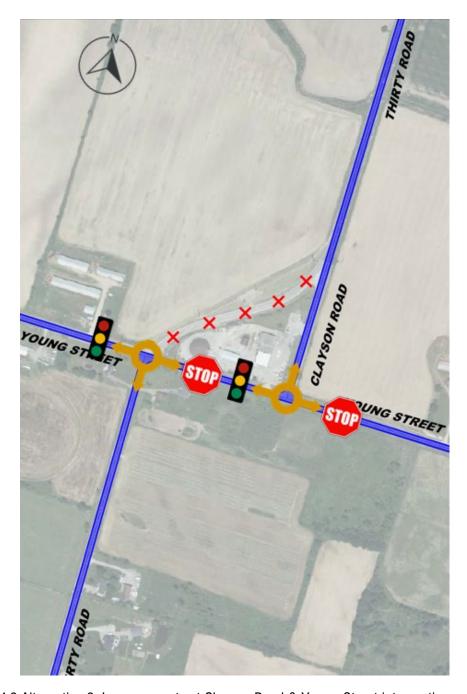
Alternative 3: Improvements at Clayson Road & Young Street intersection and Close Thirty Road Segment
